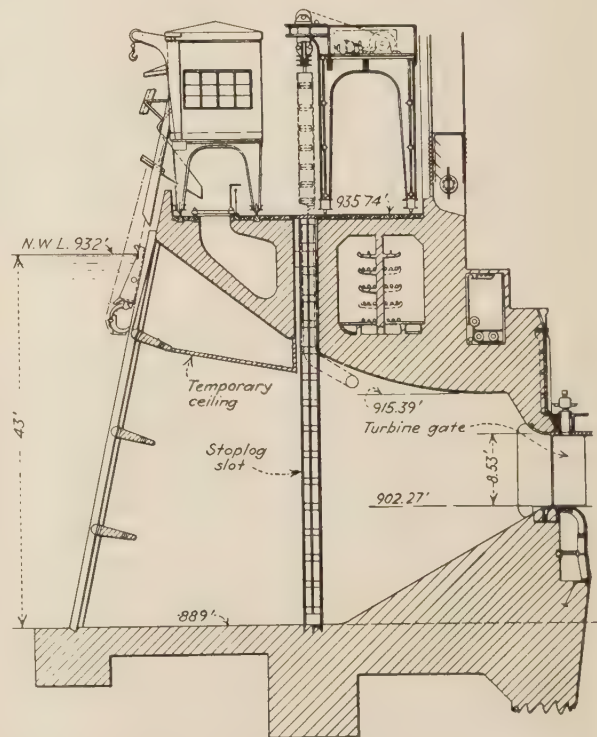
CROSS-SECTION THROUGH INTAKE WITH FALSE ROOF, RYBURG-SCHWOERSTADT
